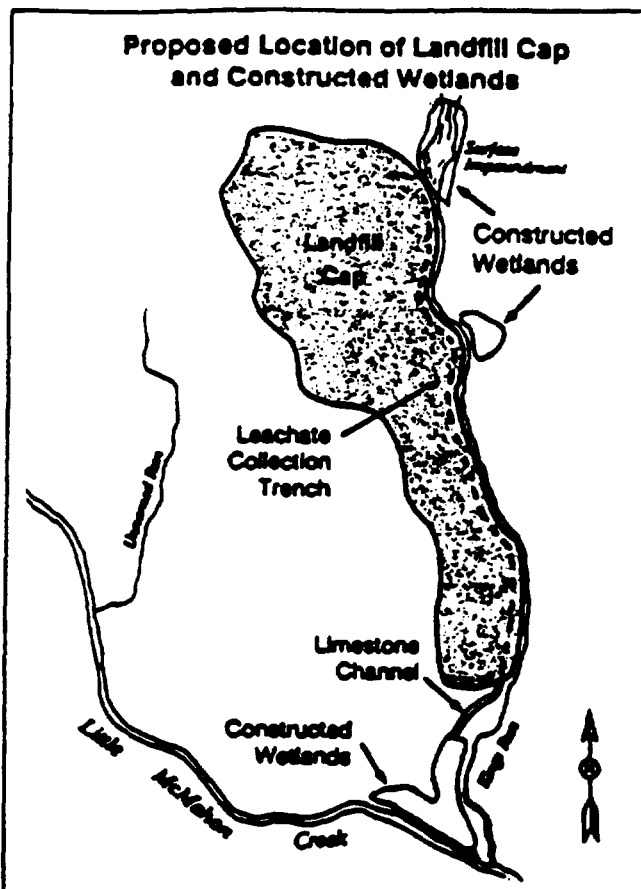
Proposed Landfill Cap and Constructed Wetlands
